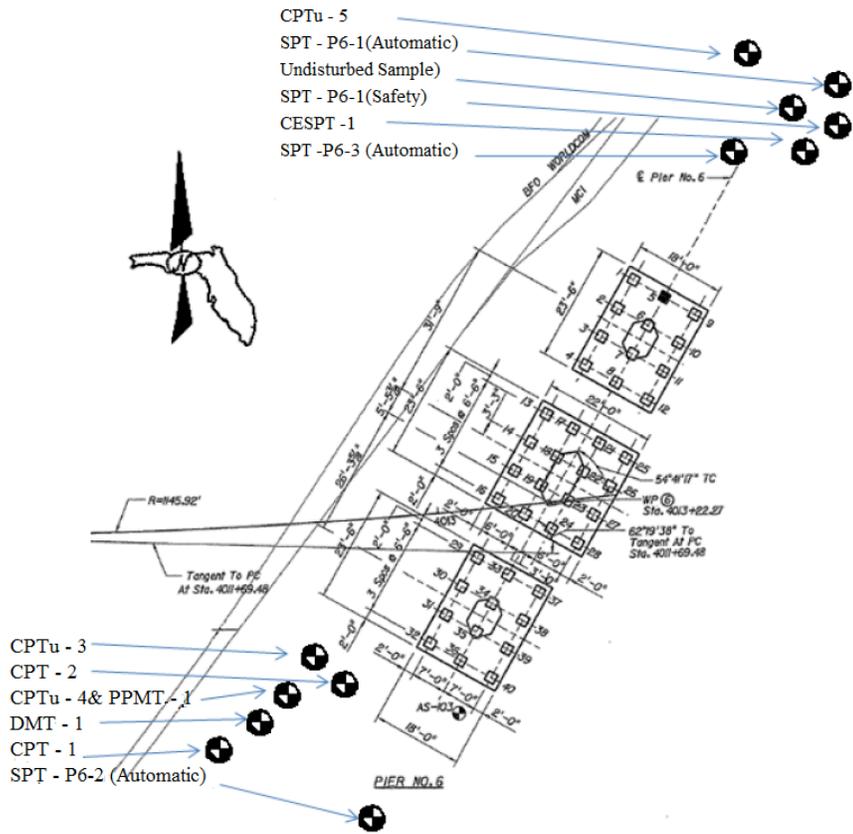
Field Retesting Boring Locations for Anderson Street Overpass near Pile #6 Pier 6
